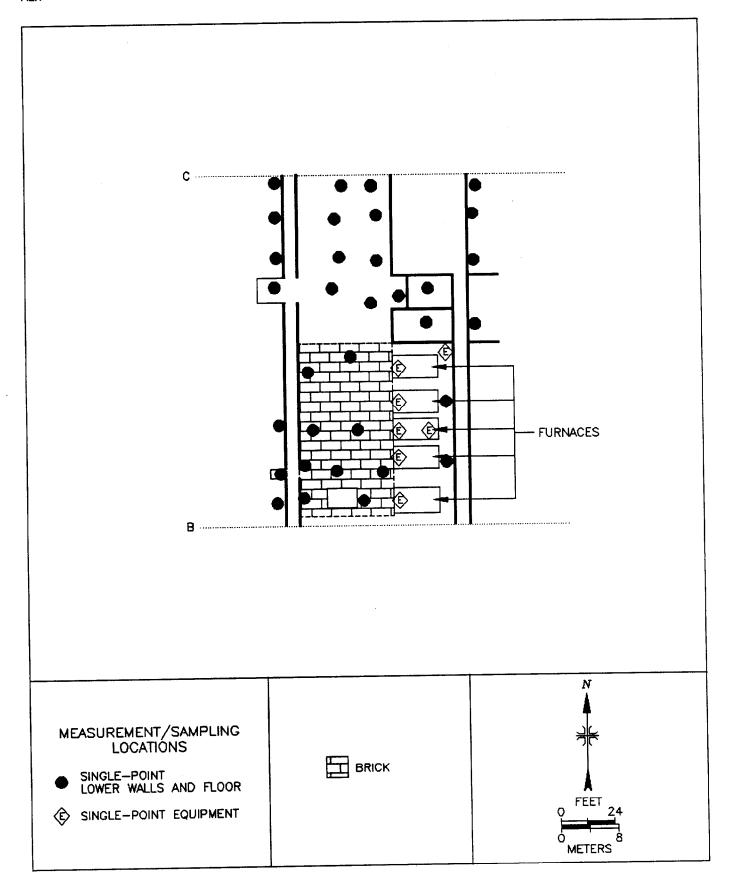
Building 1, Section C - Measurement and Sampling Locations
